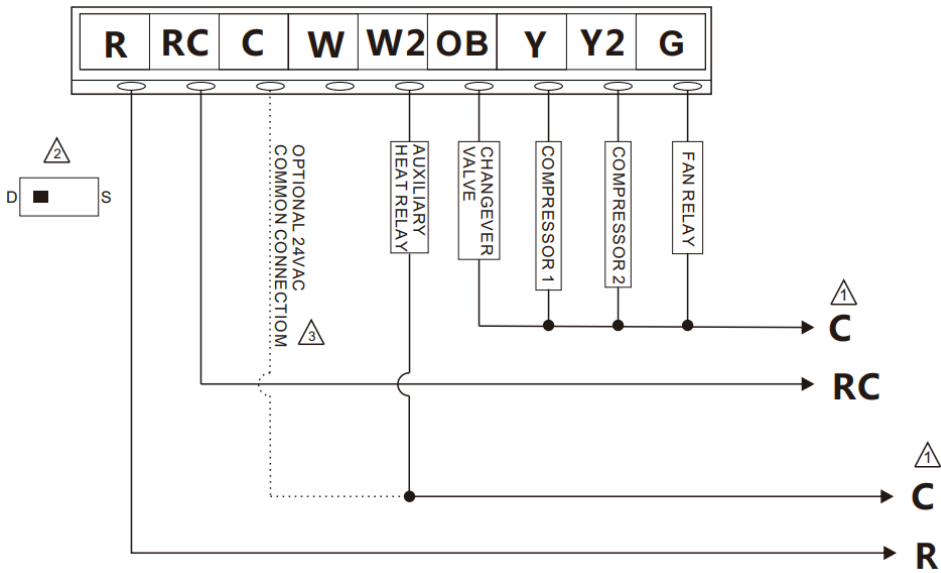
Two-stage heat & cool in heat pump (with auxiliary heat)
